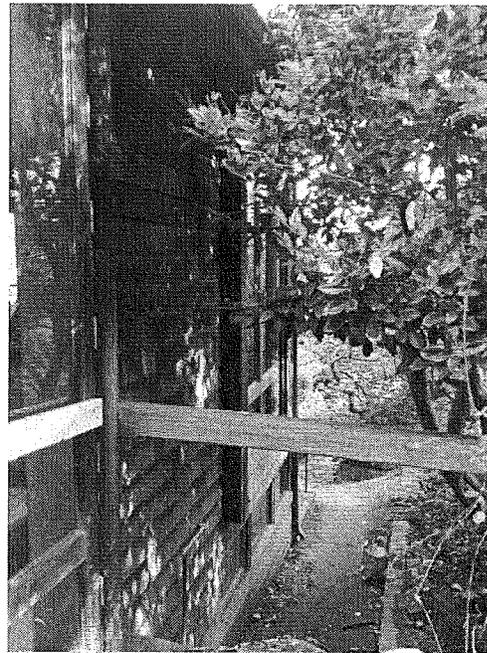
North portion of southeast façade, looking north from elevated wood deck. Basement level windows and first story window at center.
